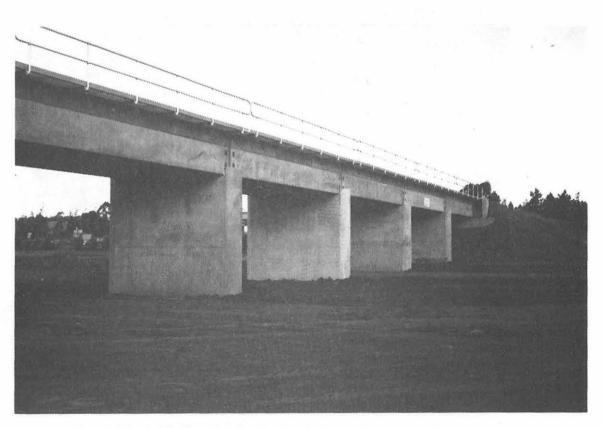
Kungala. Sherwood Creek. Timber transom top approach spans replaced by concrete & steel structure.
